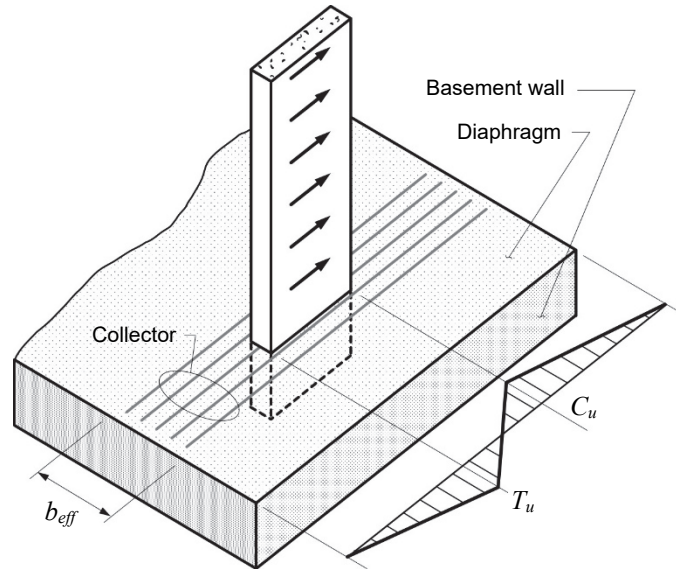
Collector transferring shear from wall into podium diaphragm.
